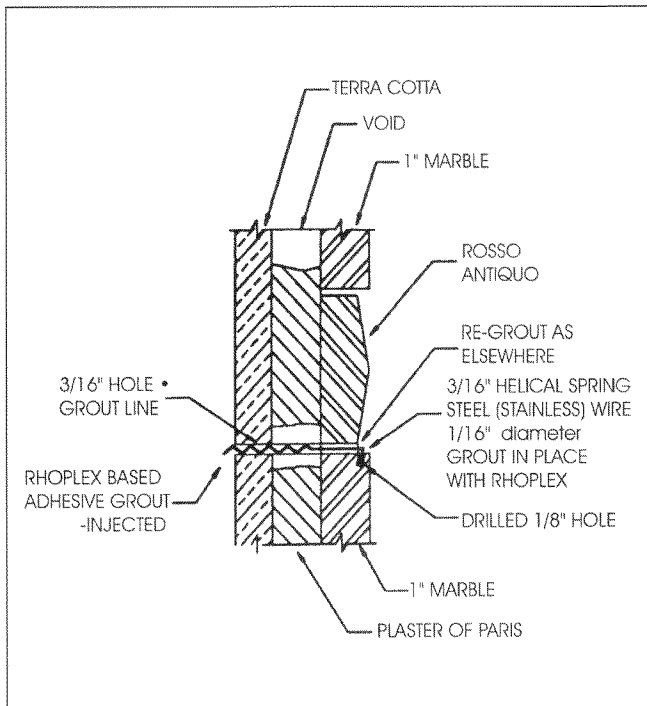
Cross section of marble cladding and wall showing mechanical connection.
